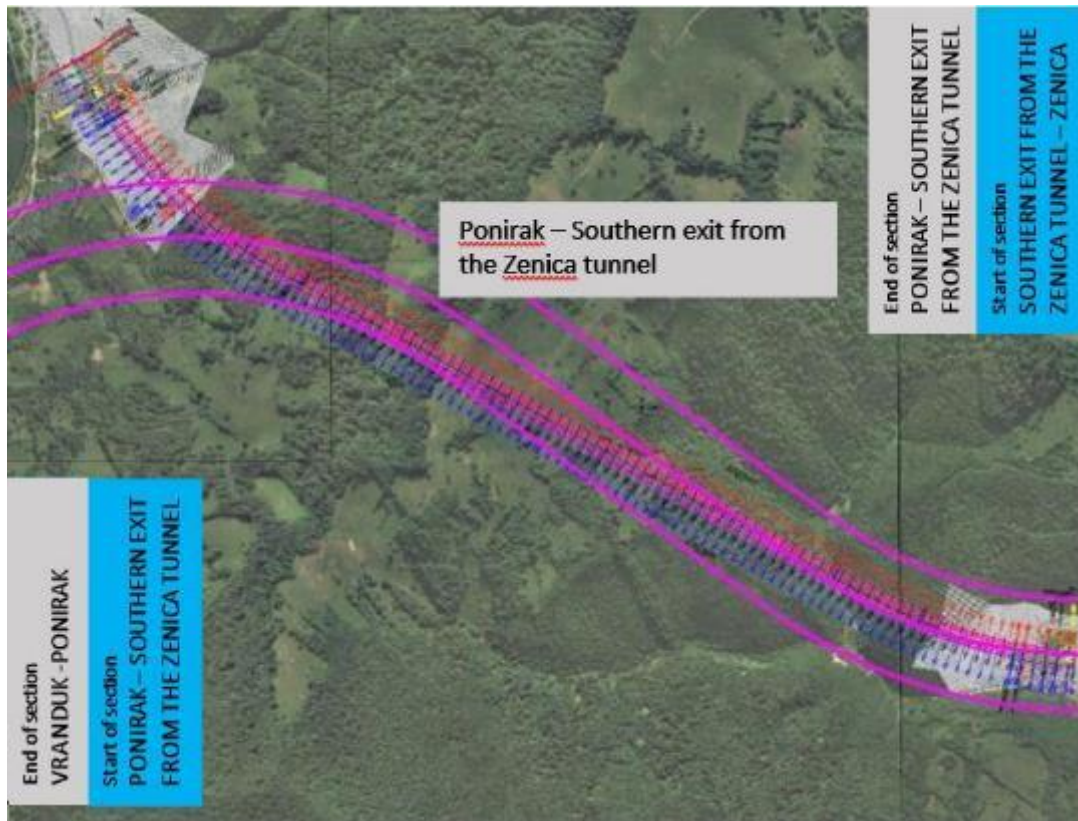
Subsection Ponirak - Southern exit from the Zenica tunnel 19
